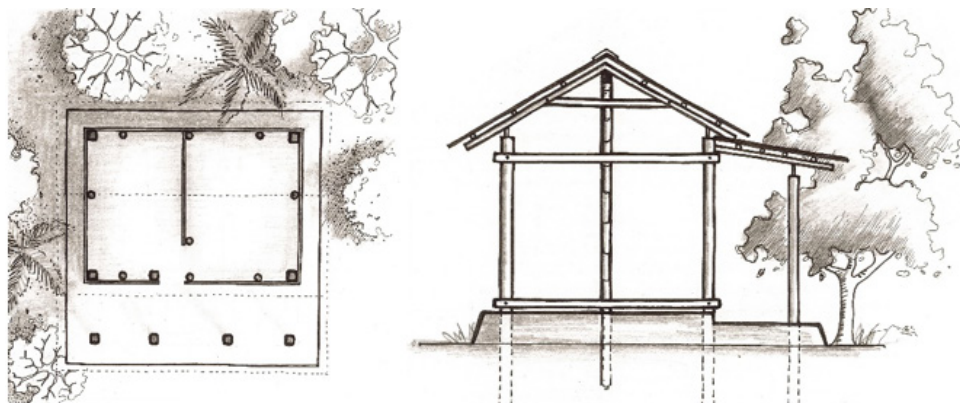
Plan and Section of CRS and Caritas Shelter (Source: Shelter Cluster)
